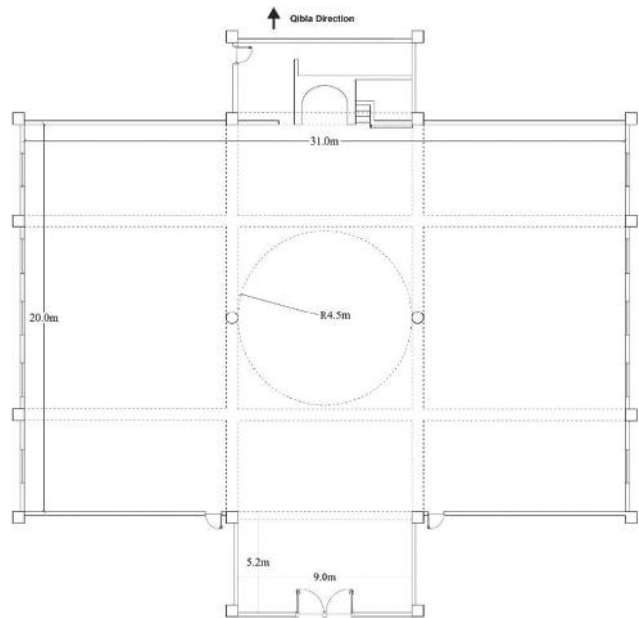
Main floor plan of the main prayer hall, Dayk Mosque.
